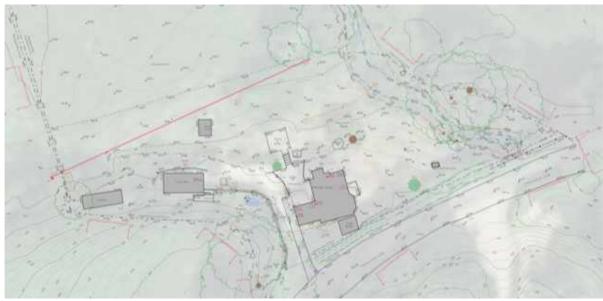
Architectural plan for the site with Wishanger Cottage to the centre of the site.
